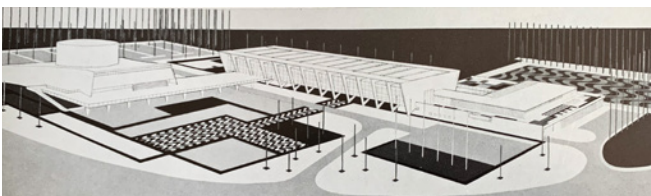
The site plan for MAM Rio. Image: (Klaus 1960).
